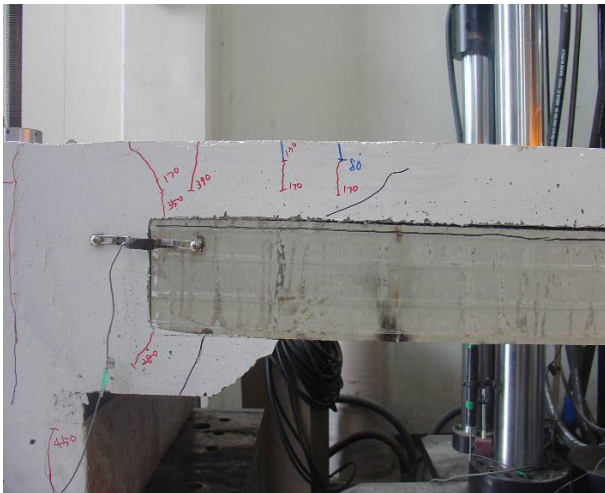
Typical failure mode of the precast FRP-concrete composite deck
